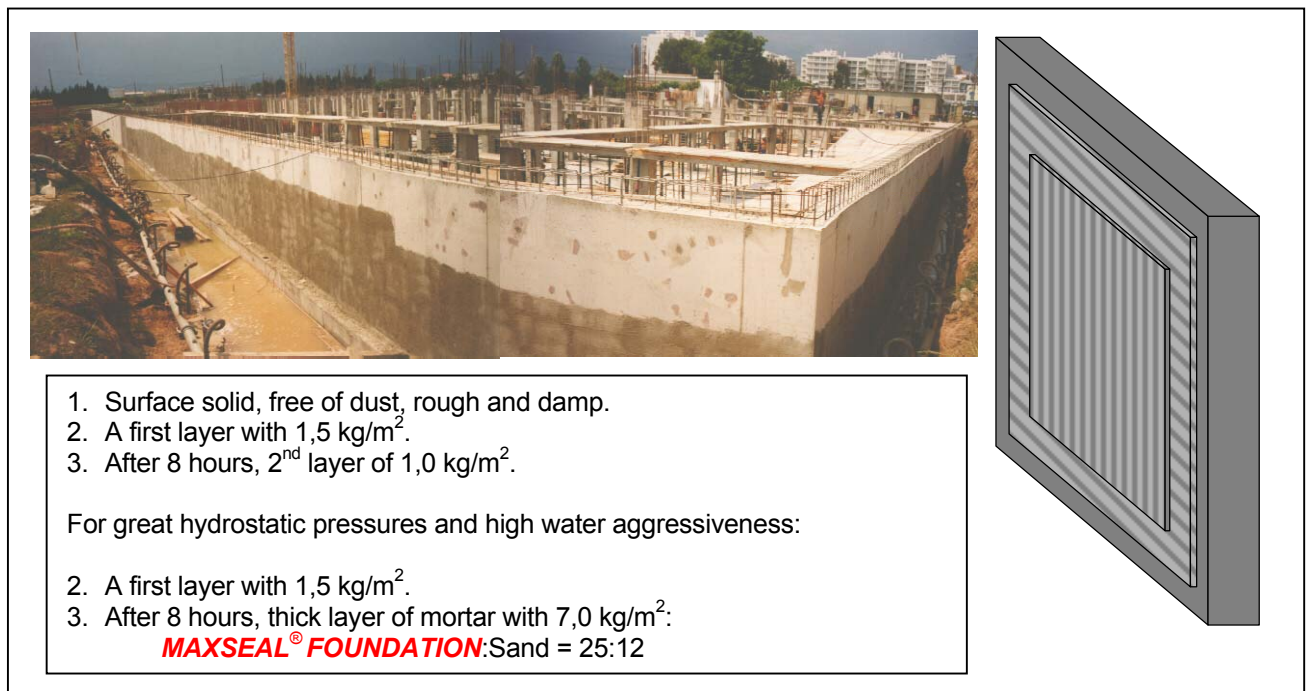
Waterproofing and protection of foundations MAXSEAL® FOUNDATION
